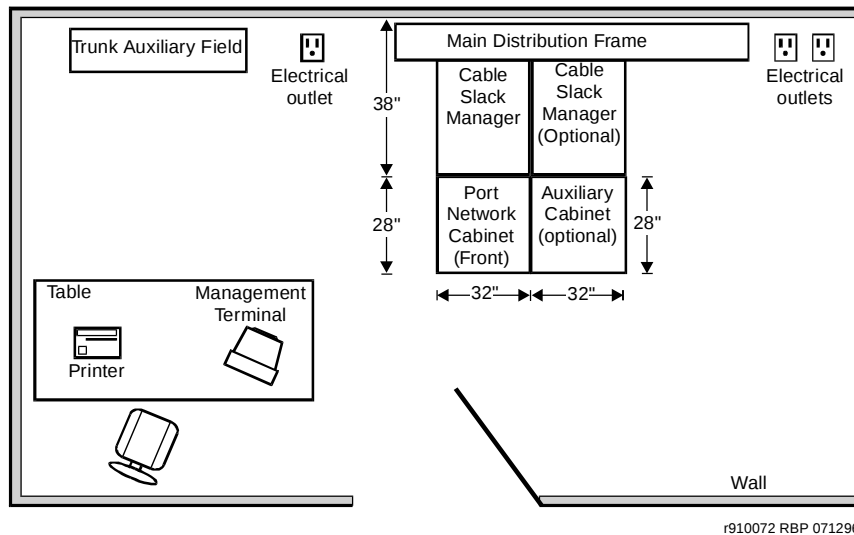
Typical Multi-Carrier Cabinet Floorplan
